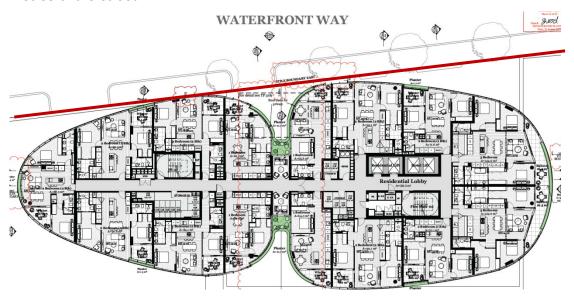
Extract of the endorsed Level 14 plan, highlighting the street boundary (from Drawing TP211)
